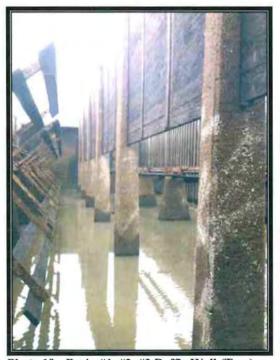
Basin #1, #2, #3 Baffle Wall (Typ.)
